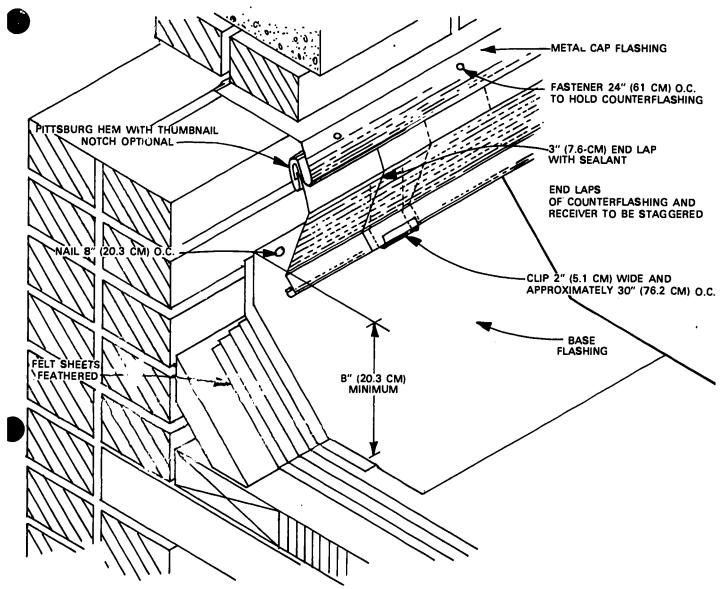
Application of base flashing and felt sheets on a wall-supported deck
